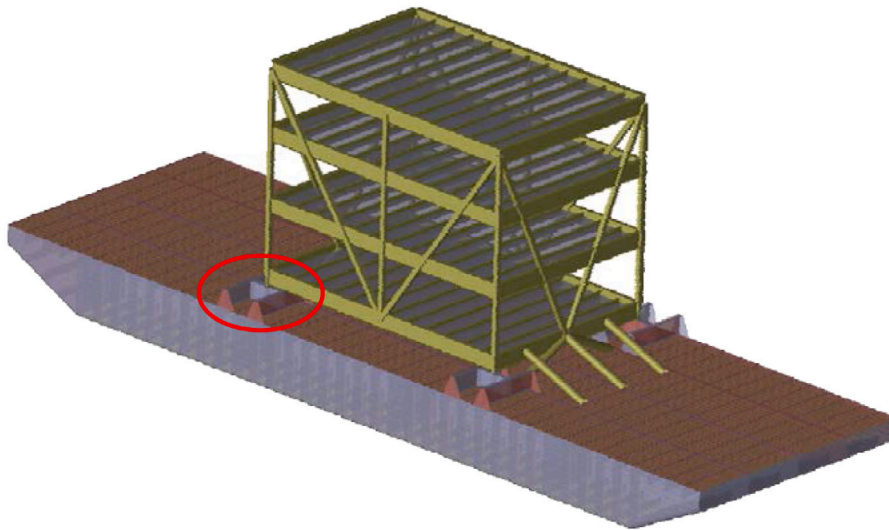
Typical flat-top barge with grillage and seafastening (roll and pitch stoppers) and the transported object (only structural steel is shown, not the mechanical equipment or outfitting structures).
